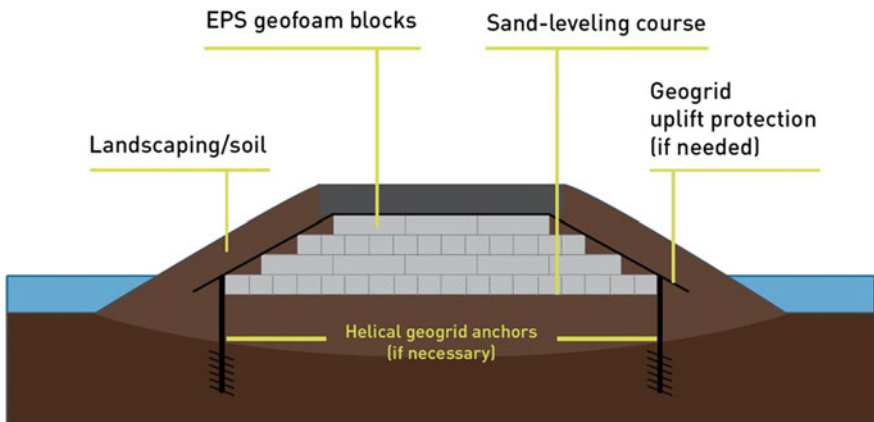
Cross section showing levee repair using geofoam blocks [27]
